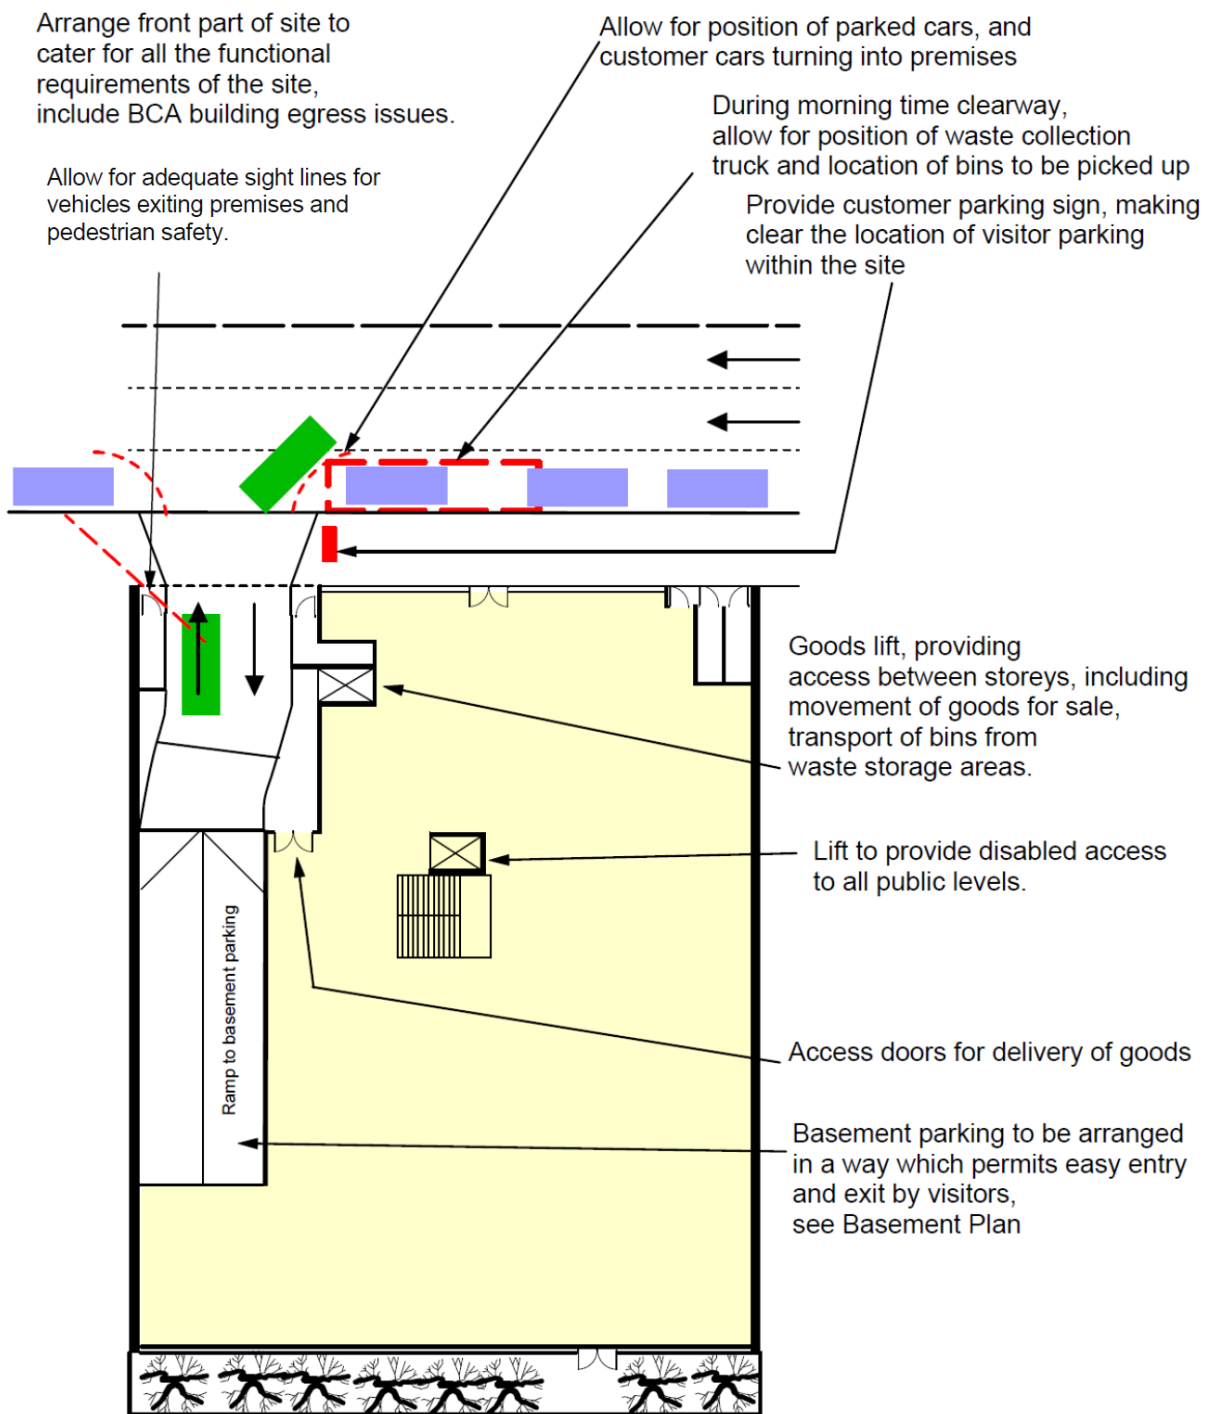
Site Access and Parking Location Principles diagram for consideration of site width and commercial development showing ground floor plan (level 1 plan not shown).
